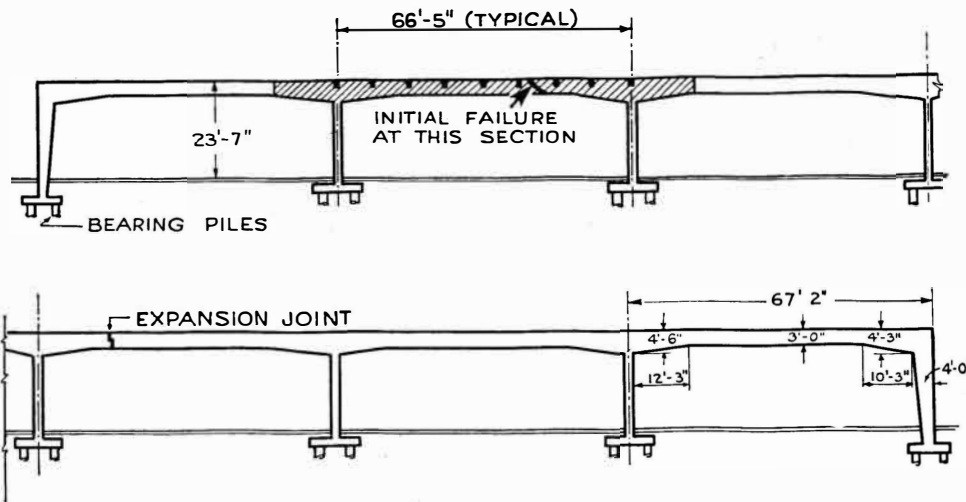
Typical 400-ft frame at Wilkins depot. Shaded portions represented by laboratory specimens
